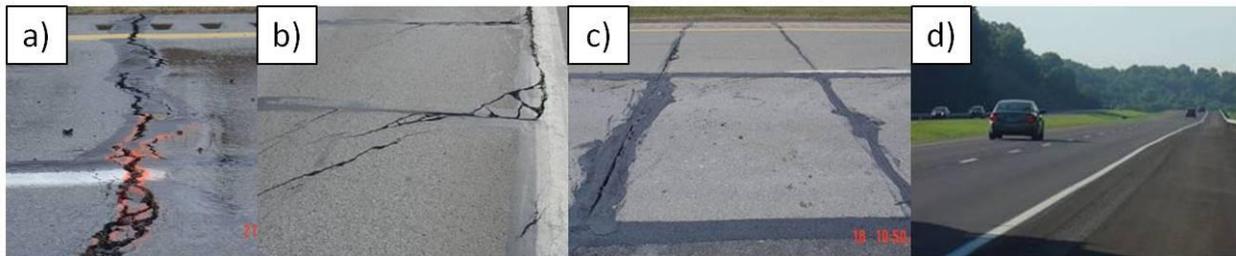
Panel LW-52 photographs showing (a) transverse cracking, (b) corner breaks, (c) highway deformation between saw cuts in the slabs, and (d) rehabilitated highway surface (Photographs from PA DEP files).
